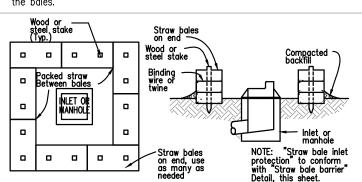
B. Plan and section view of properly installed bale drop inlet protection.
